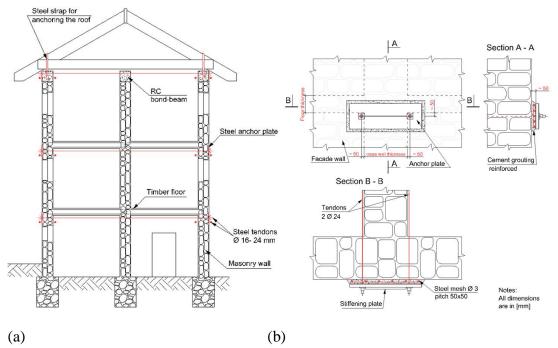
Binding of opposite walls. Layout of the rods (a) and fixing details (b) [14]
